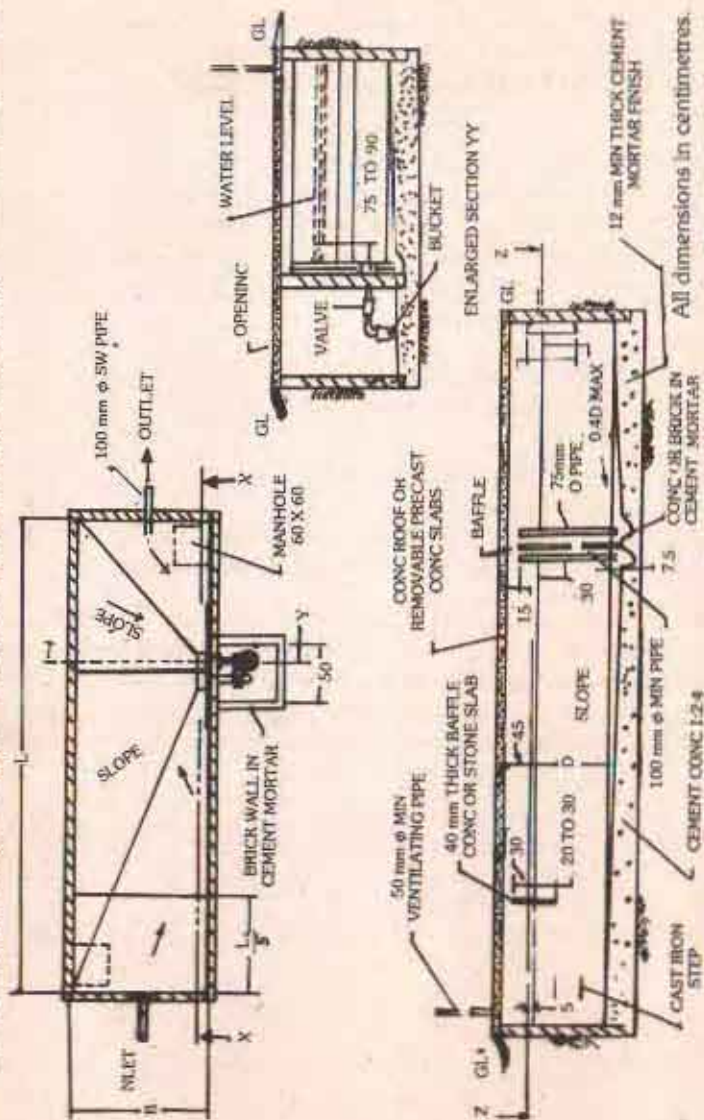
Typical Design of a Septic Tank for Large Installations
